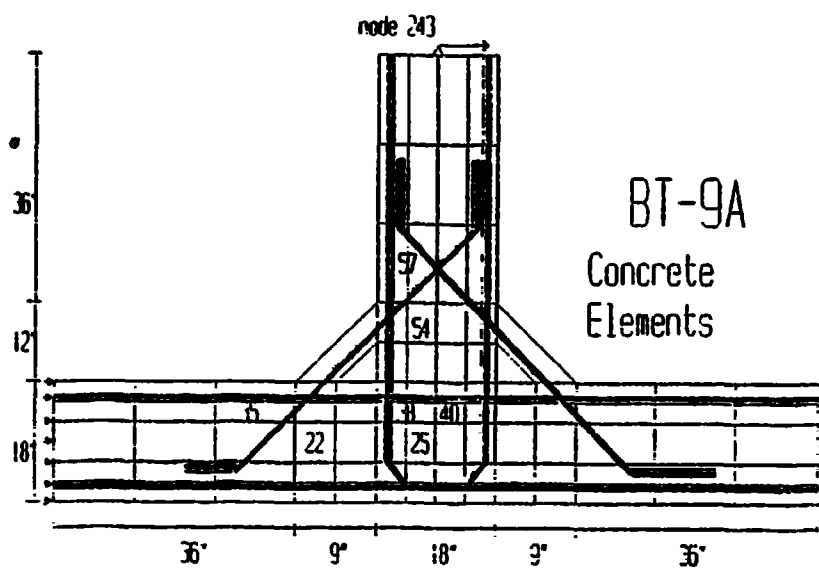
Connection detail BT-9A with labeled concrete and steel reinforcement elements.
